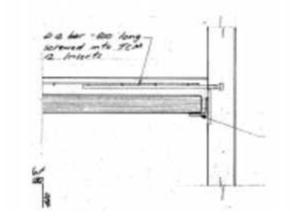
circa 1987 typical pre-cast concrete floor unit bearing and structural topping detail (original).
